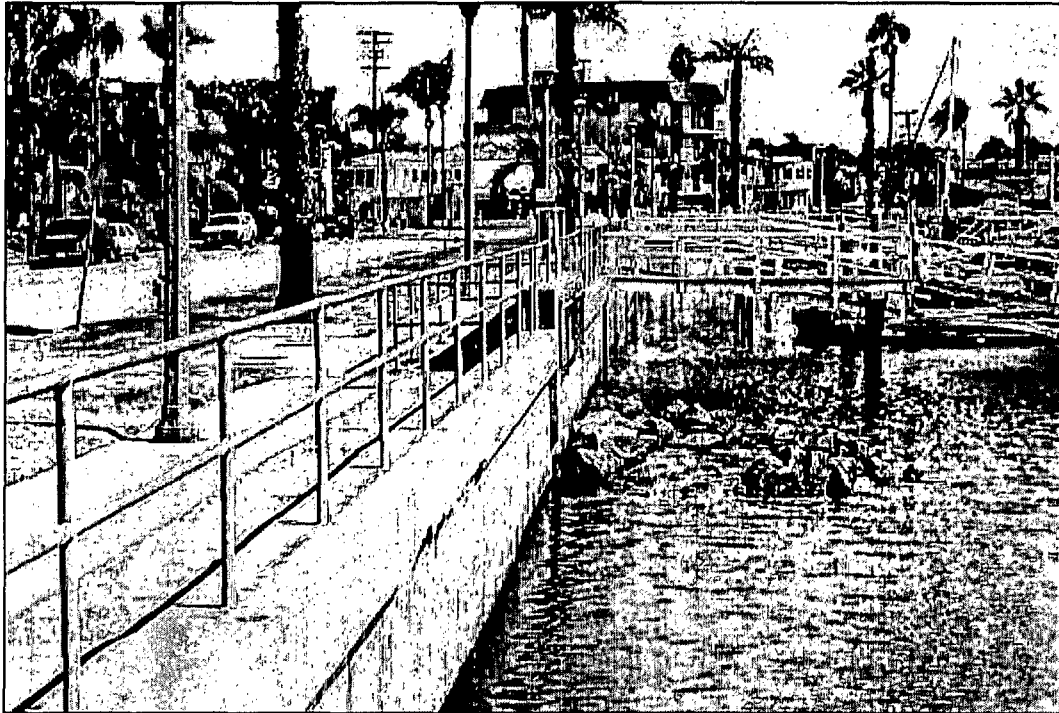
Belmont Pump Station Monitoring Site – Pump Station Outfall and Monitoring Equipment
